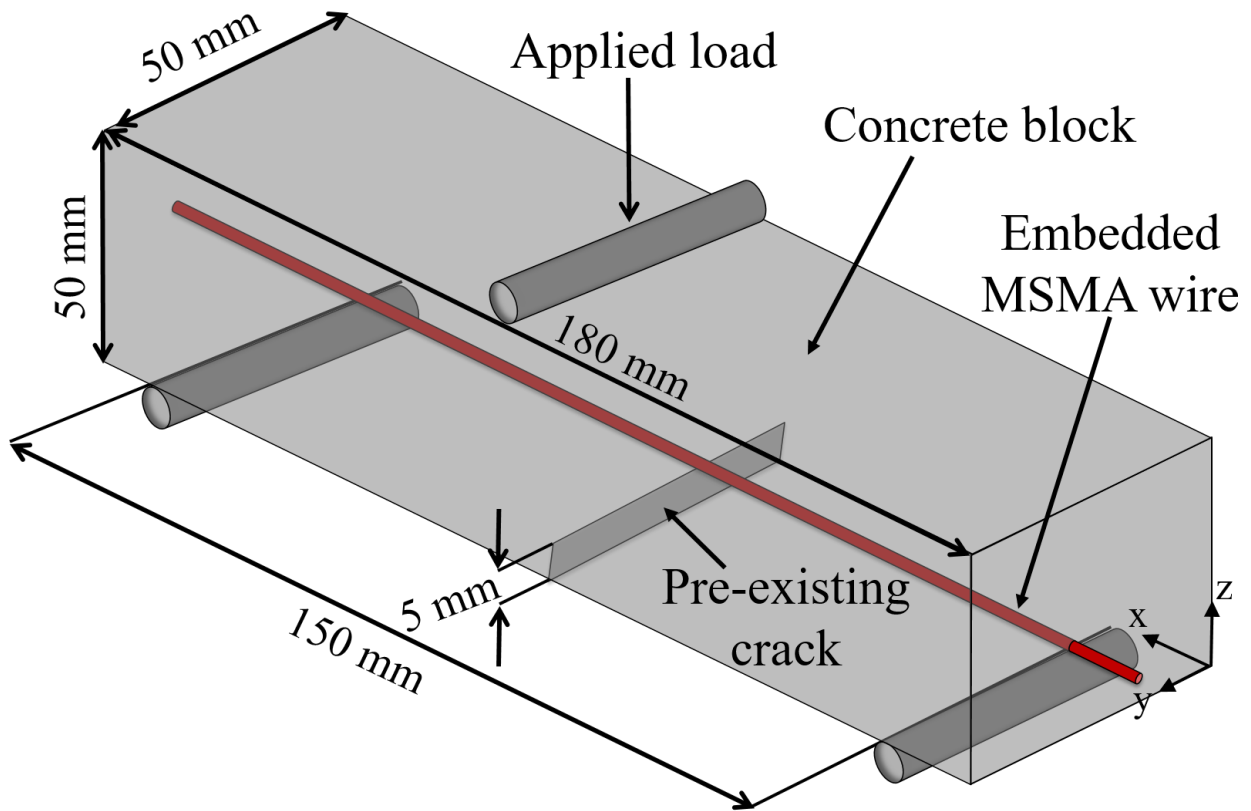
Structural mechanics model consists of a concrete block with a pre-existing crack and an embedded MSMA wire, subjected to three-point bending.
